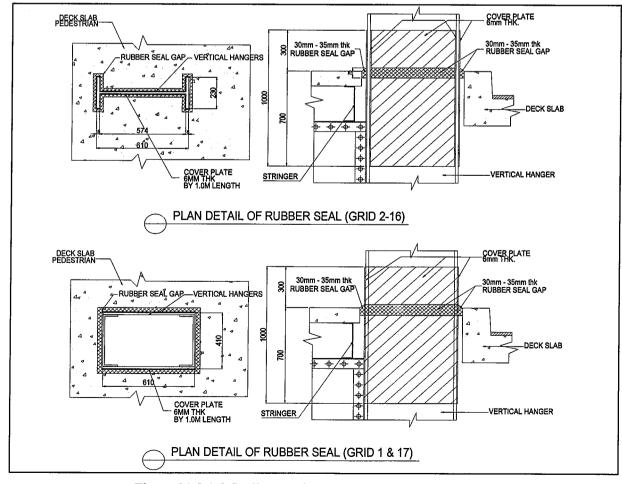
Sealing gap between Hangers and Deck Slab
